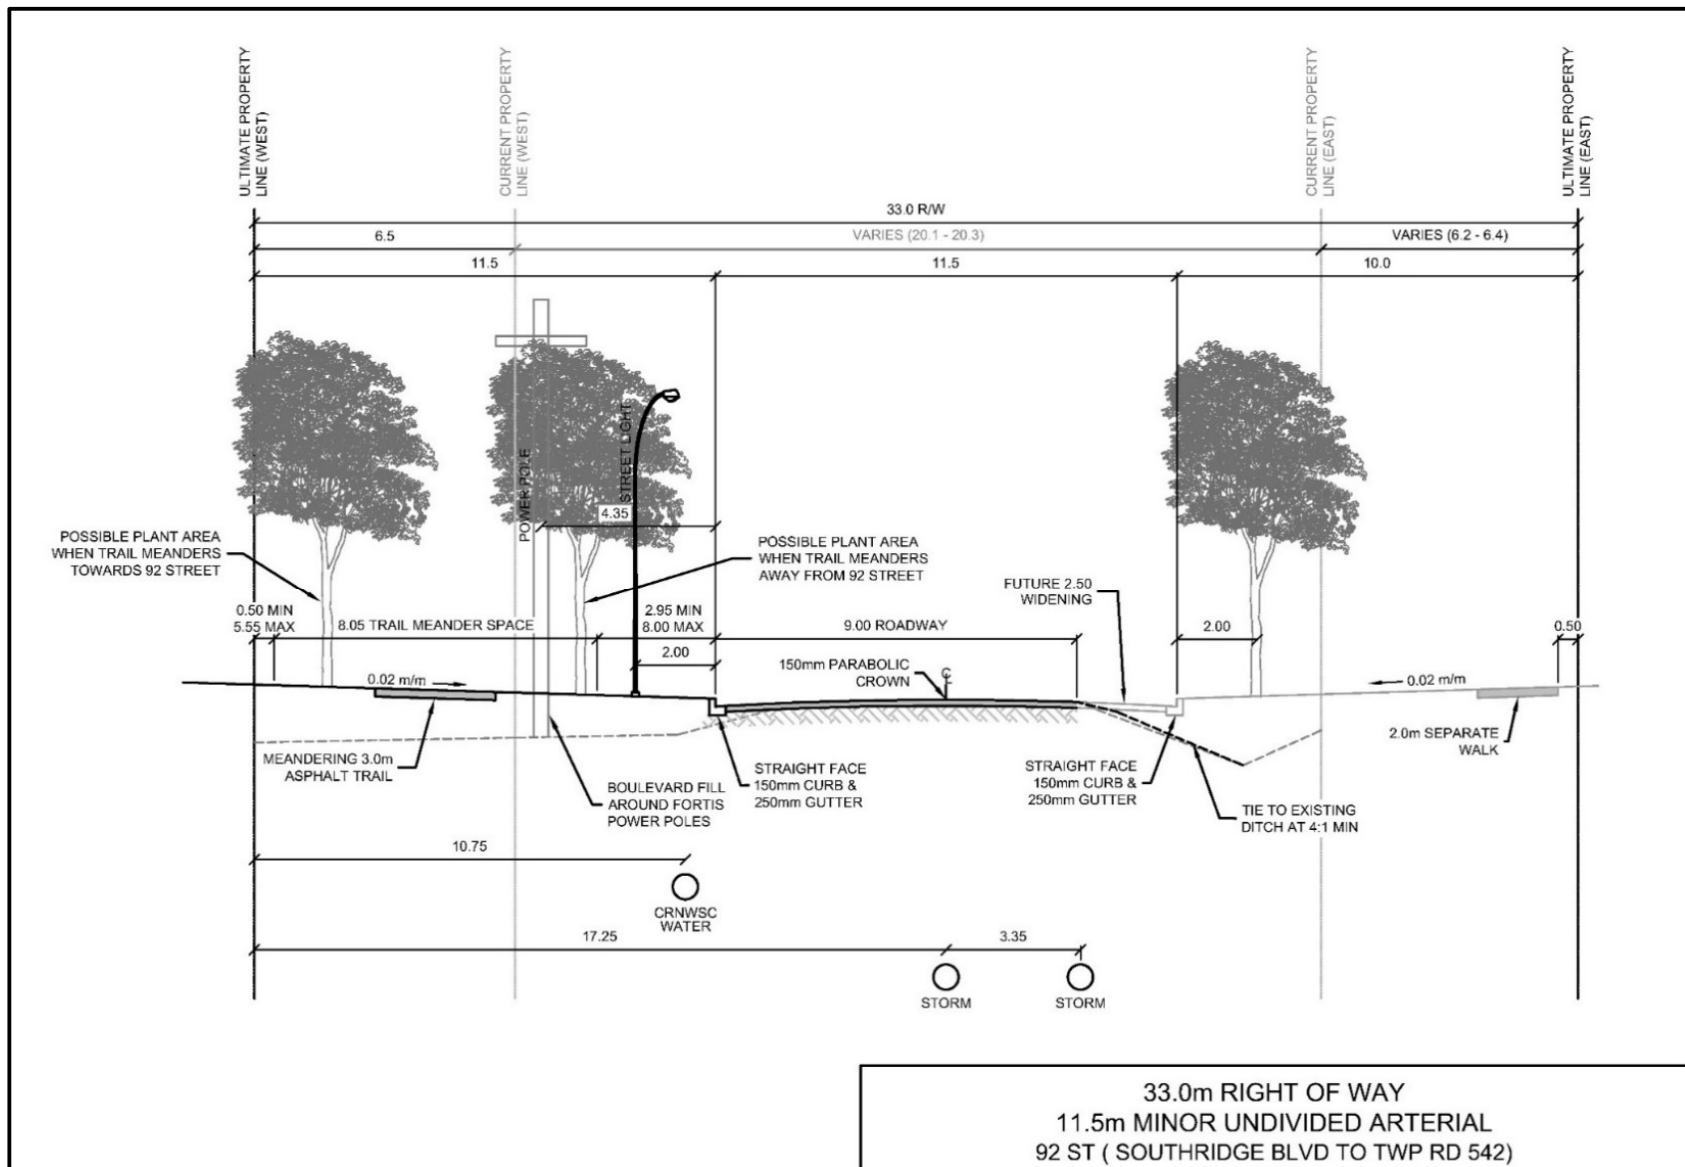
Proposed 92nd Street Enhanced Pedestrian Cross-Section
